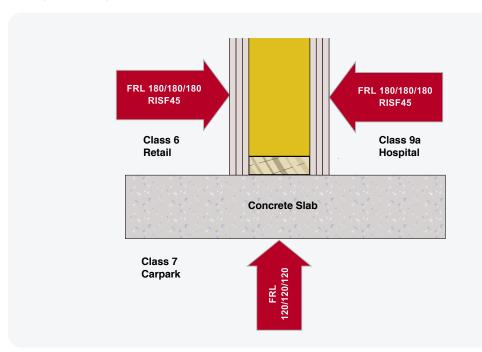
Typical timber frame detail for separation of different parts of the example building.
